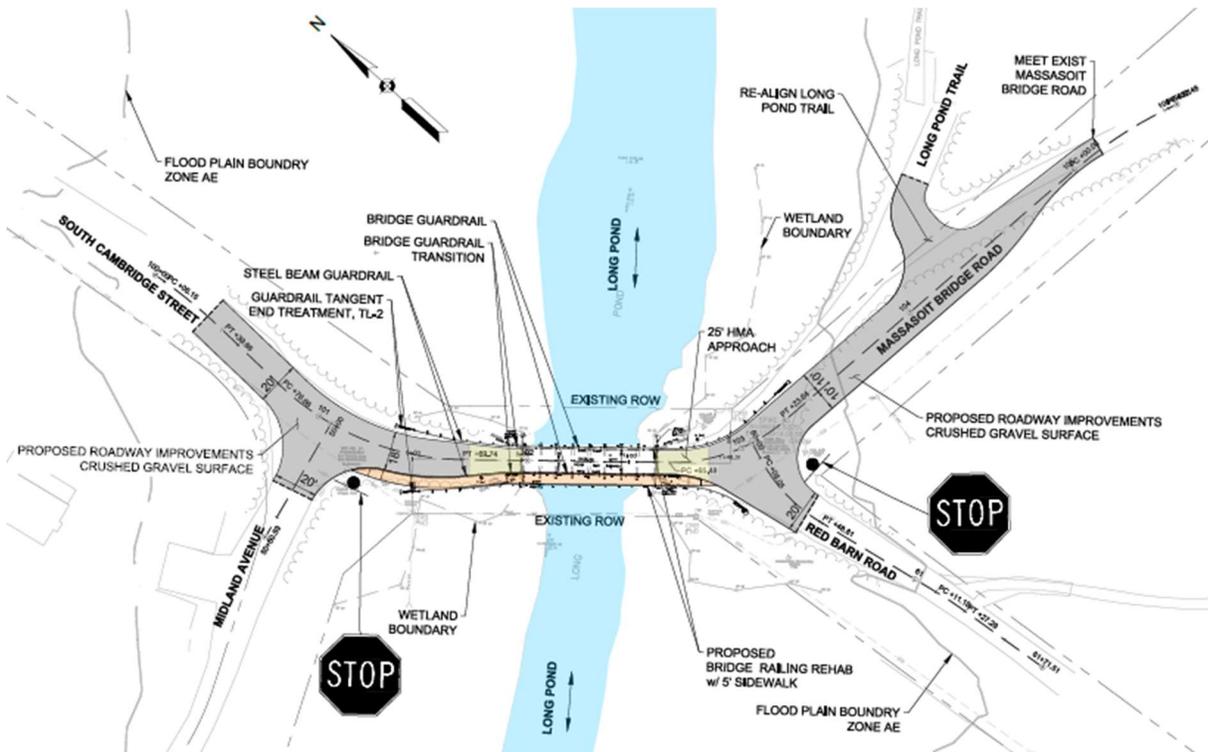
Massasoit Bridge Rehabilitation with Sidewalk - Option 2b
